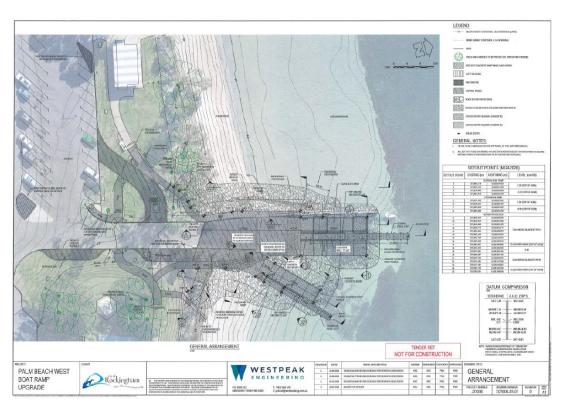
General arrangement for refurbished Palm Beach West Boat Ramp Facility
